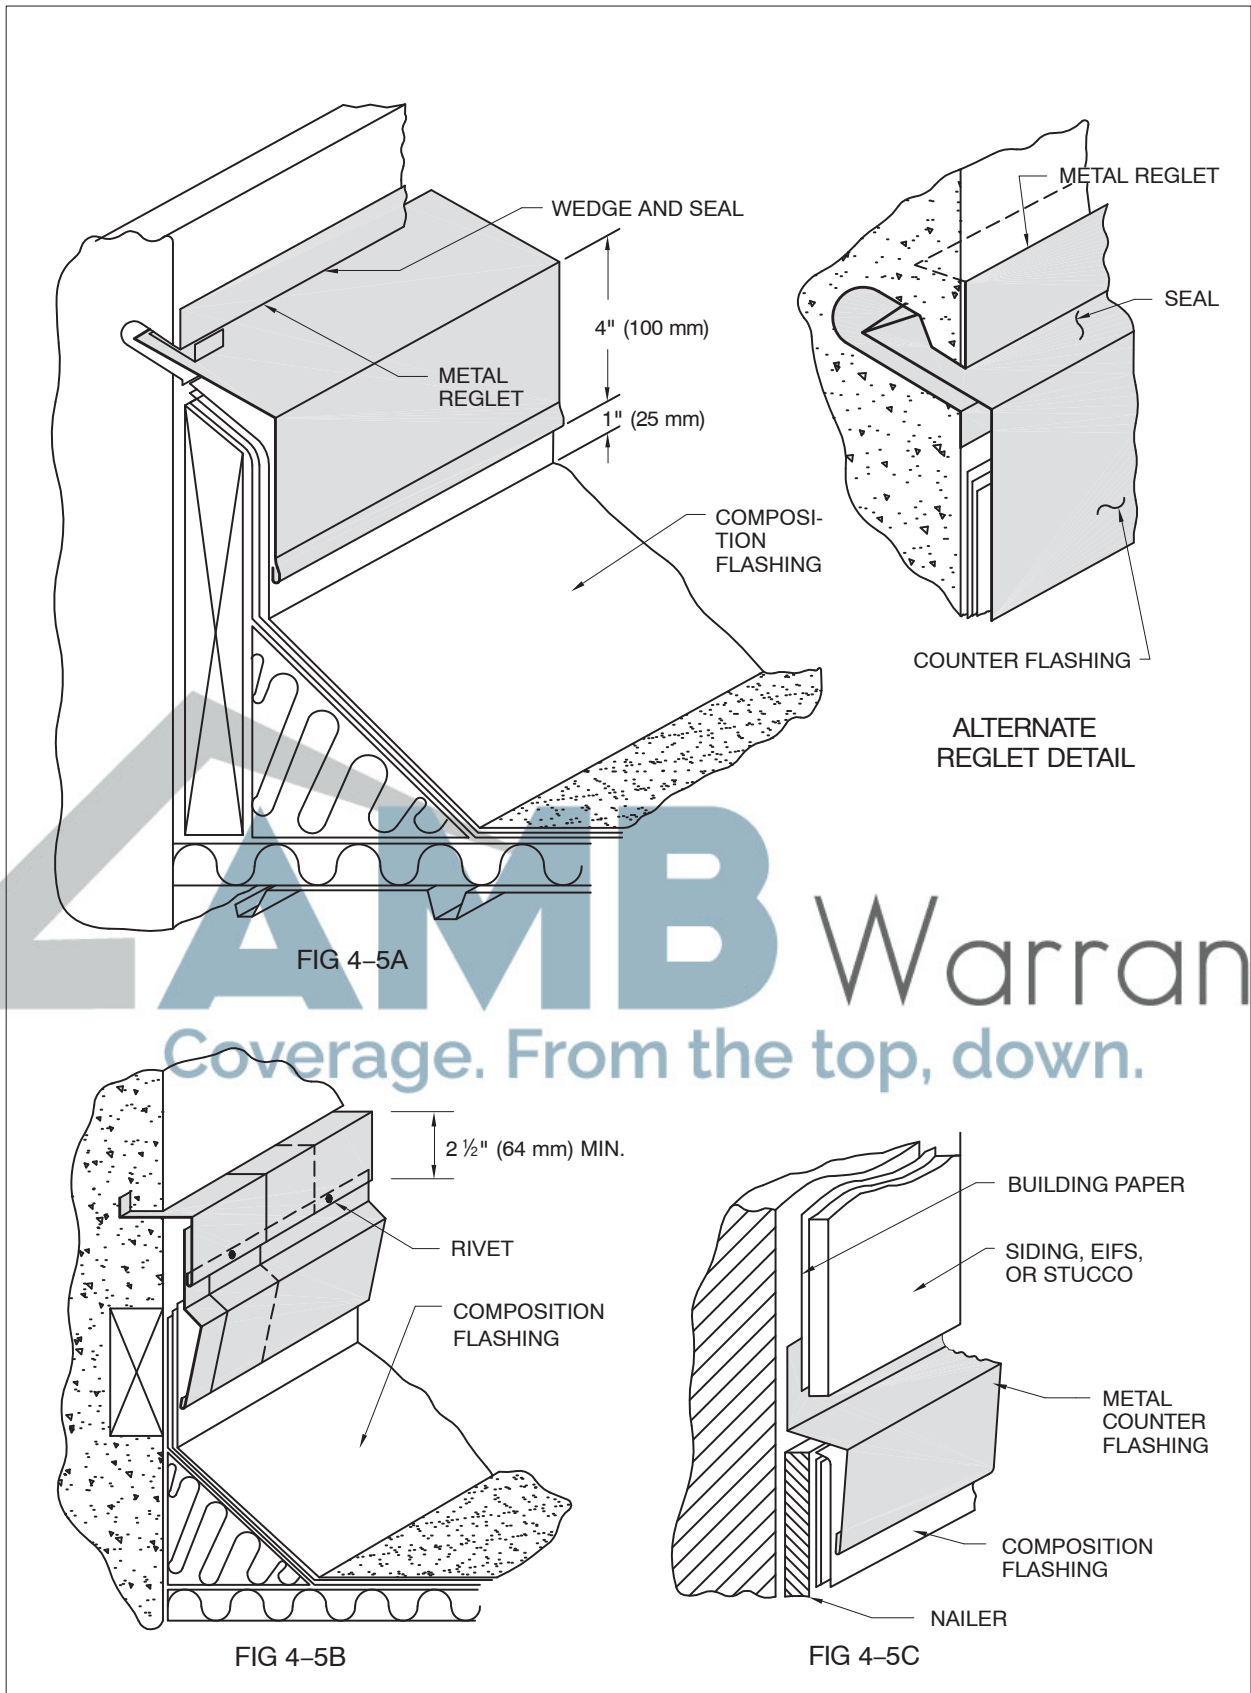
COUNTER FLASHING SYSTEMS — INSTALLATION
